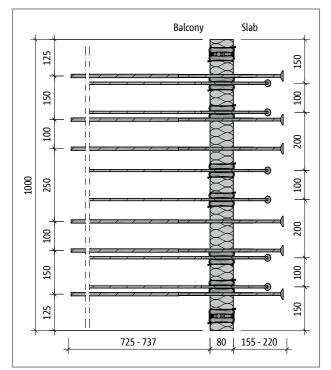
Schöck Isokorb® T type K-U-M2: Product layout
